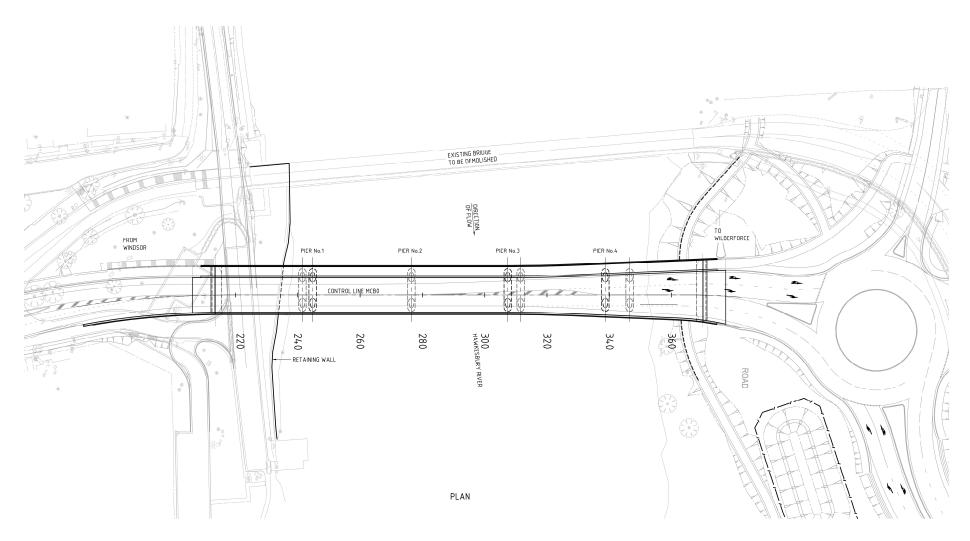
Changed pier locations – Note grey indicates original pier location and black indicates new pier location
